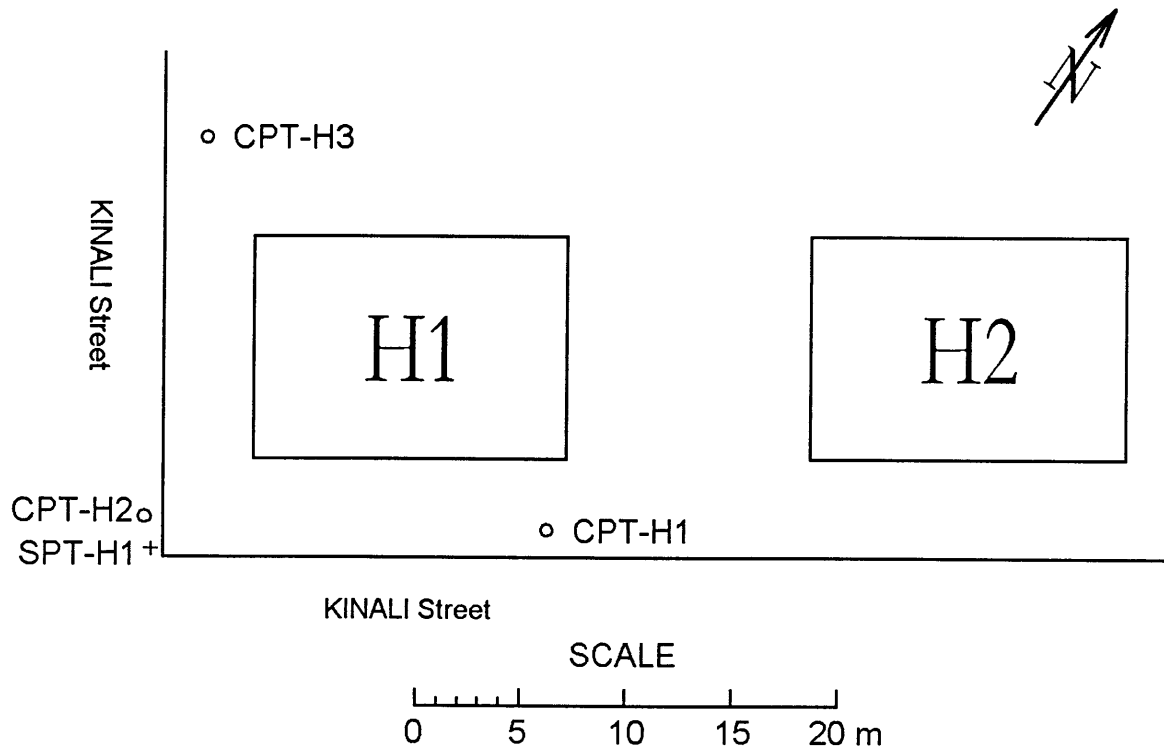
Plan view of Site H and location of subsurface exploration points
